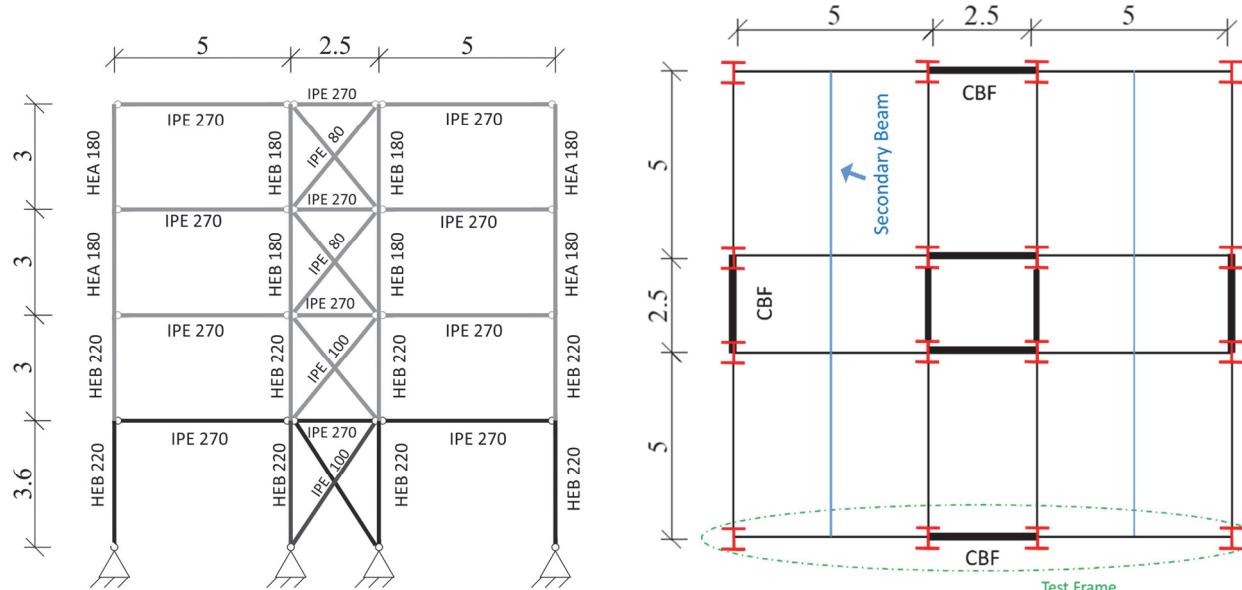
Elevation and plan of the building (dimensions in meters)
